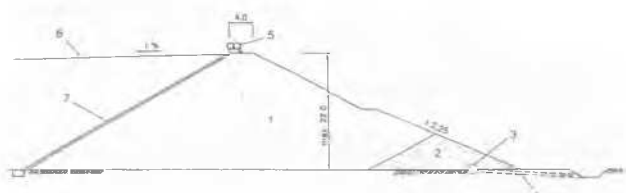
Cross-section of Gilow tailings dam. 1-Medium and fine sand compacted by equipment. 2-Sand-gravel mixture. 3-Drainage. 4-Concrete conduits. 5-Tailings supply pipelines. 6-Beach. 7-Concrete plates 6x6m (15cm thick) on mortar.
